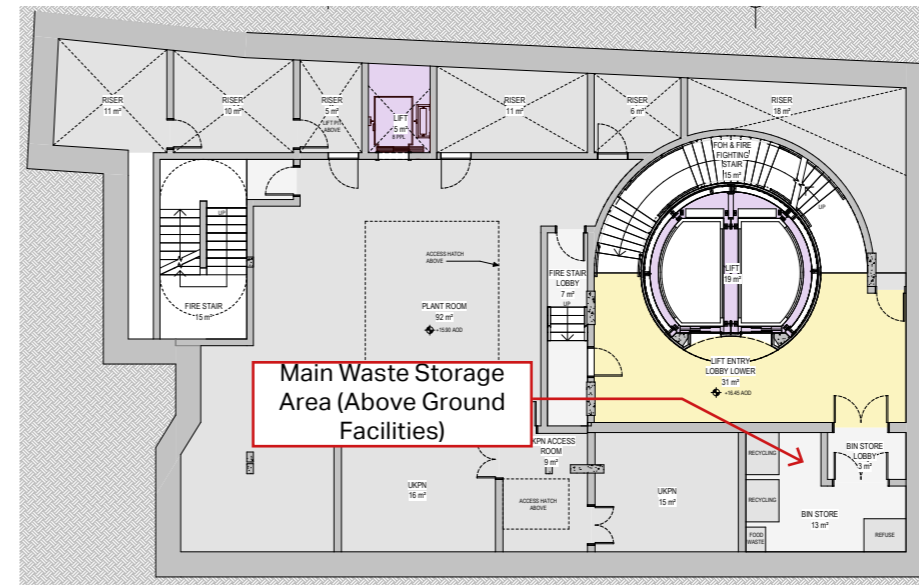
Location of the waste store for the Furnival Street above ground facilities
